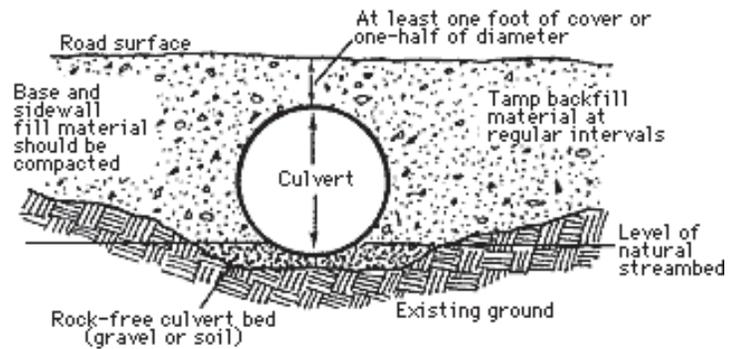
Cross-section of proper culvert foundation backfill and compaction.
